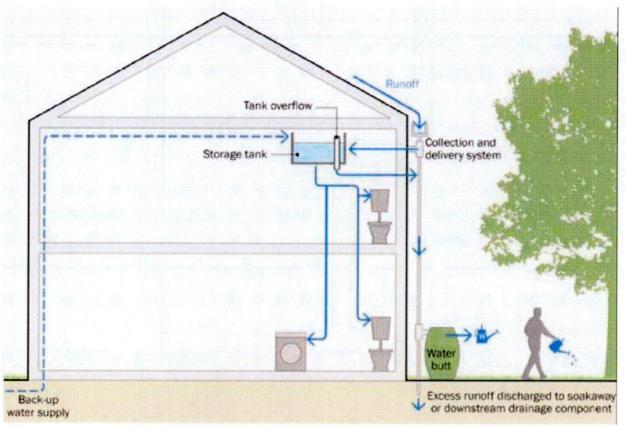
Gravity fed rainwater system to be installed for each dwelling
